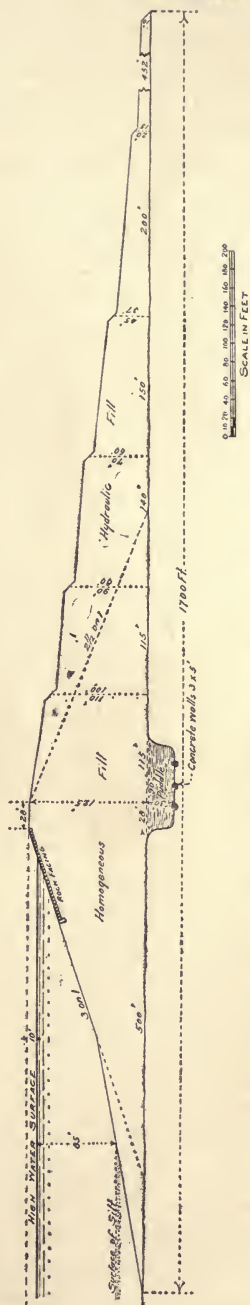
DEVELOPED SECTION OF SAN LEANDRO DAM.
